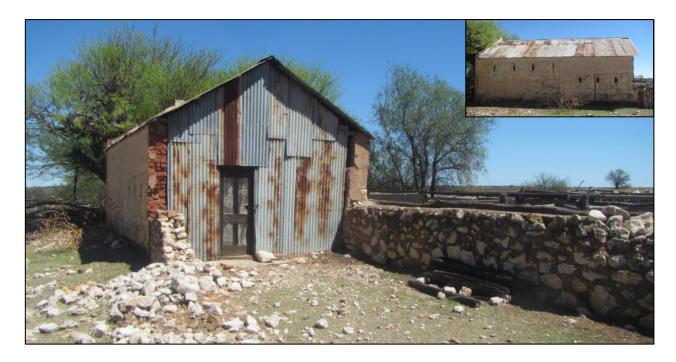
Brick shed with an end wall missing at waypoint 300. Inset: the south wall with several small opening and the western gable intact.
